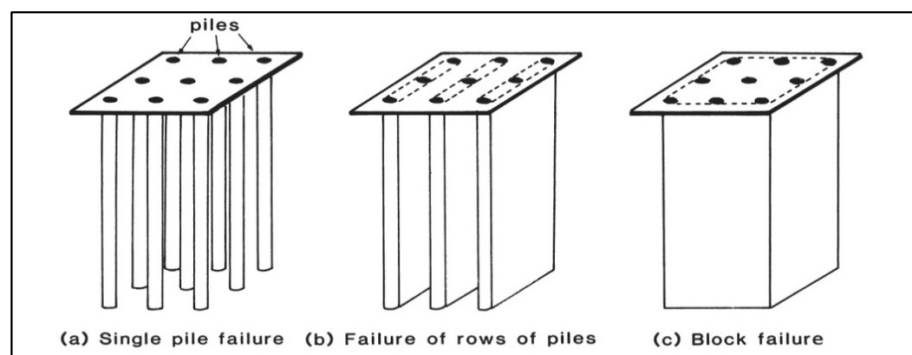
Different failure mechanisms of pile foundations (Fleming et al., 2009)
